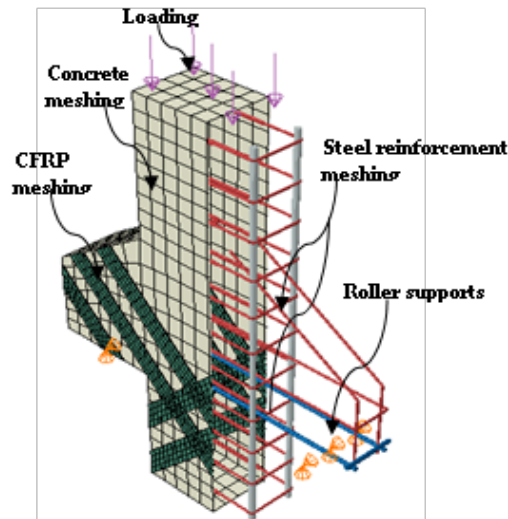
Meshing of concrete element, steel reinforcement, and CFRP strips
